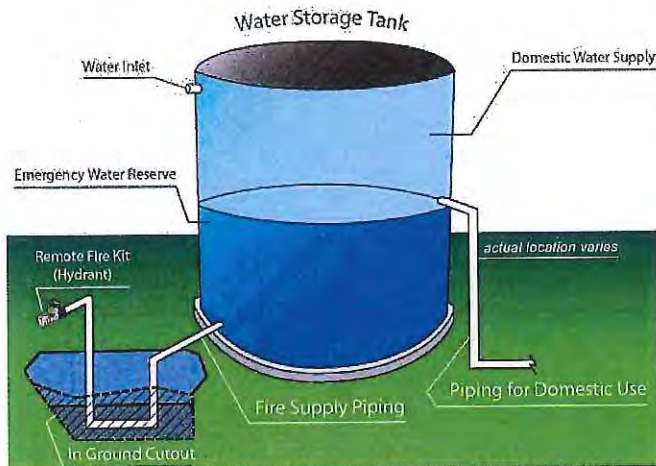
Typical layout of steel water tank for fire and domestic supply
